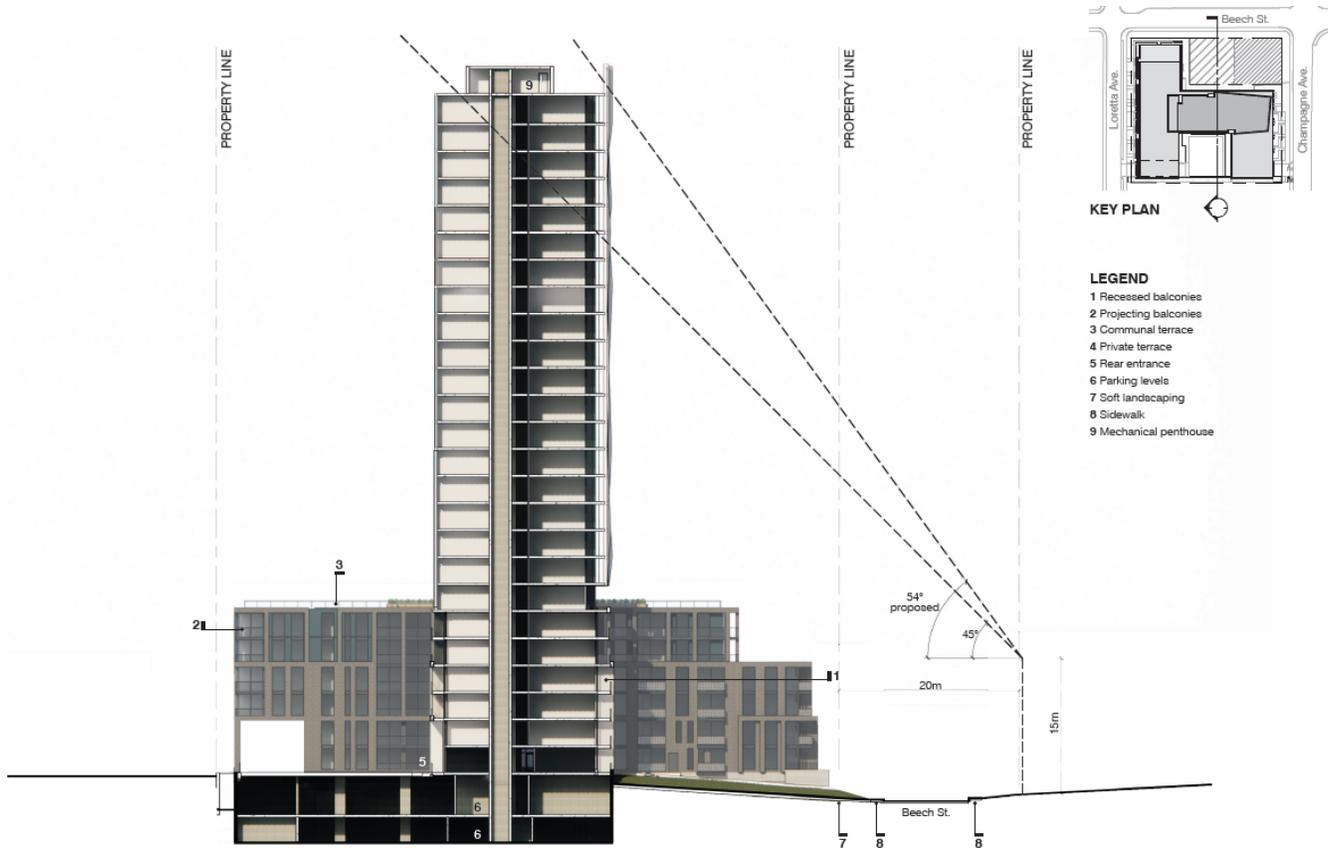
Building Cross-Section with Angular Planes Shown (looking west)
